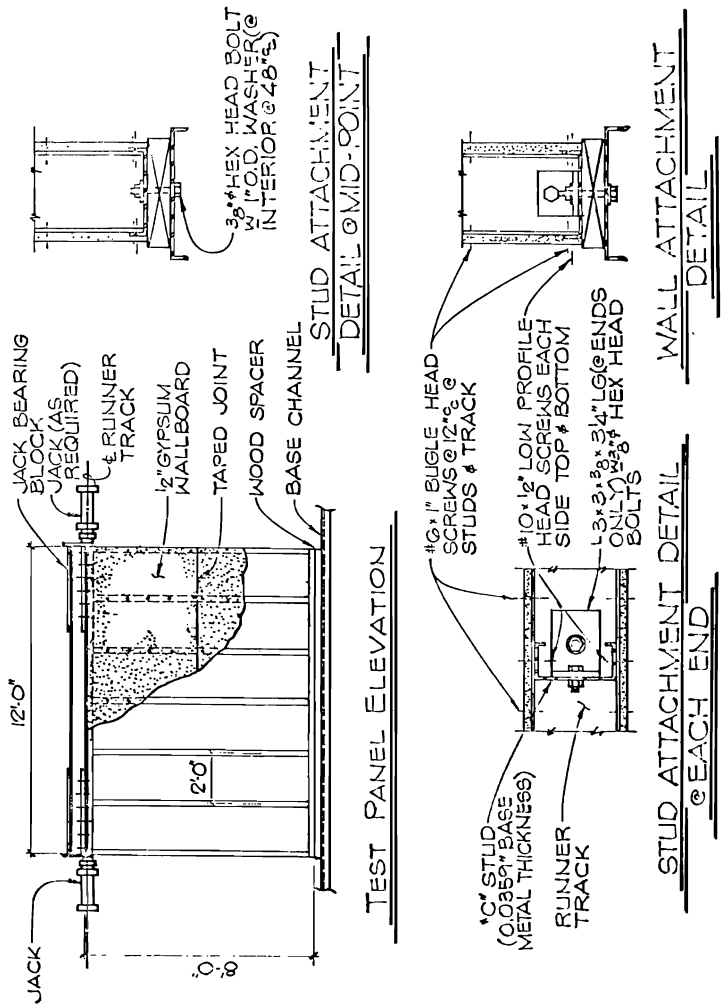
Test Assembly Plan & Details - Wall Type "B"
